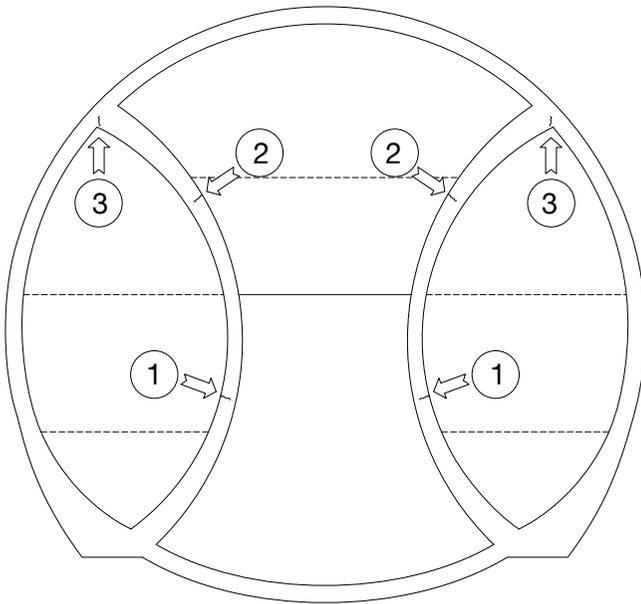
Crack pattern occurring in the walls of the side drifts
